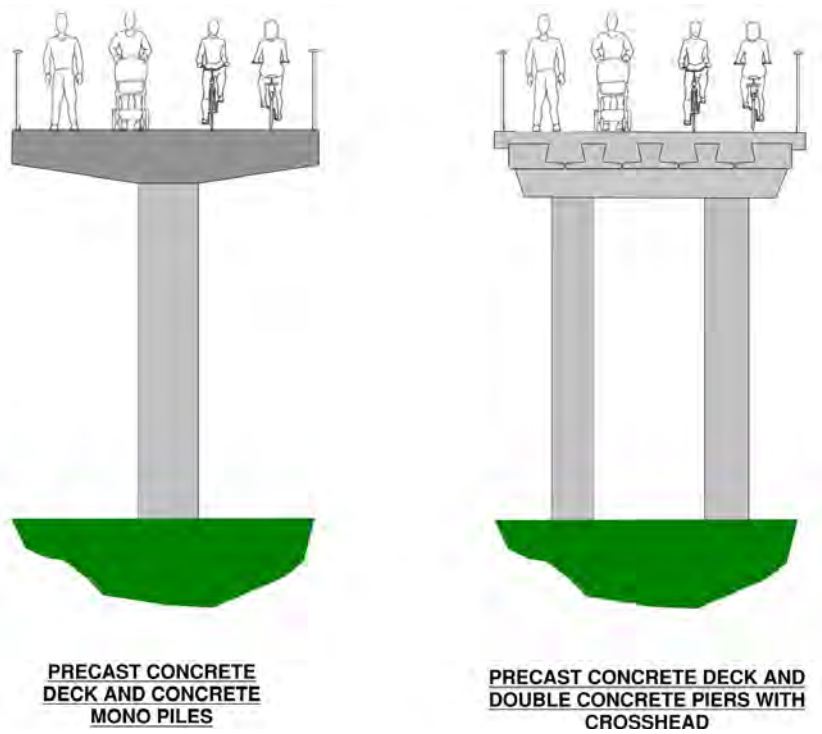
Indicative cross section for reinforced concrete structural forms for elevated ramp structure
